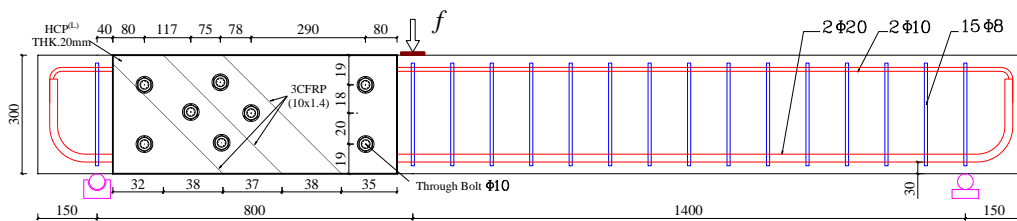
Details of repaired beam (there was no transverse steel reinforcement in the critical shear span of the beam; a combination of epoxy adhesive and through bolts were used to fix the HCP^(L) reinforced with 3 CFRP laminates; $f'_c = 31.26 \text{ MPa}$, $f_y^{\Phi 20} = 576 \text{ MPa}$).
